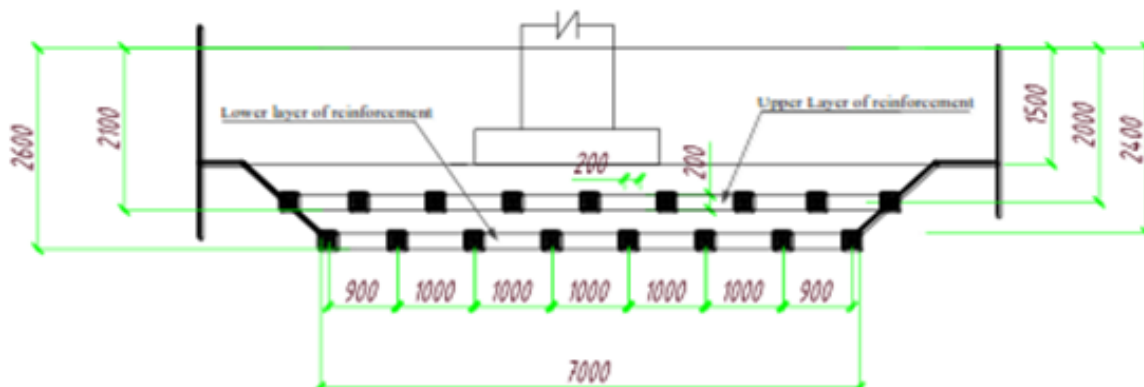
Cross-sectional sketch showing arrangement of the reinforcement.
